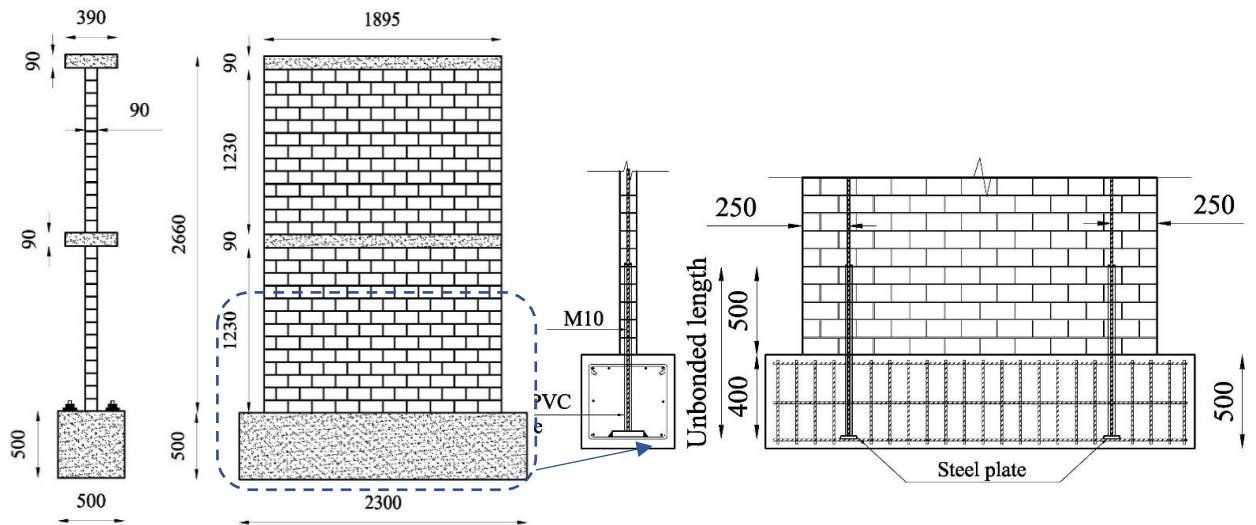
Energy dissipation connection inside the walls (all dimensions are in mm).
